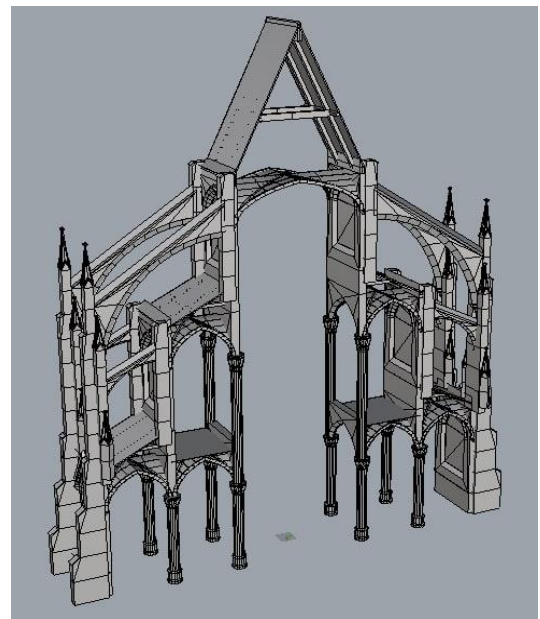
3D section showing construction elements including stone vaults and timber roofing structure - <http://www.turbosquid.com>
